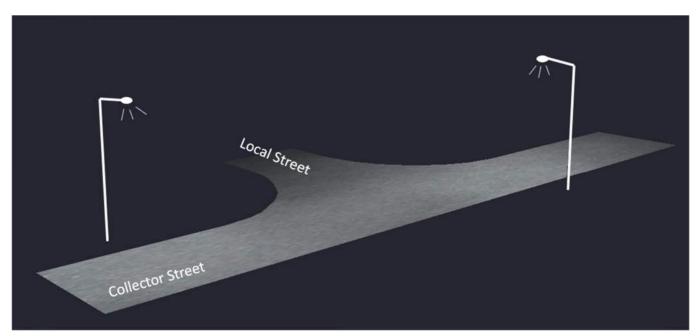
Rendering of T-Intersection: Local Street vs Collector Street – Isometric View
